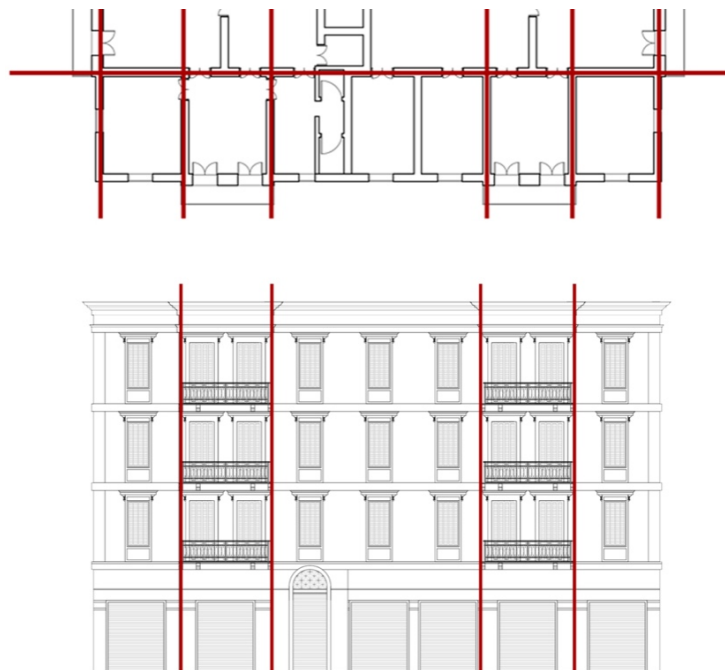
case study building external façade rhythm throughout the design with relation to the internal layout, source: the researcher.
